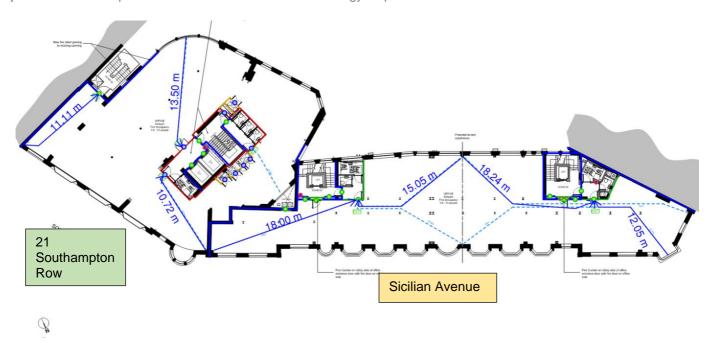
21 Southampton Row - Typical Upper Floor Plan
